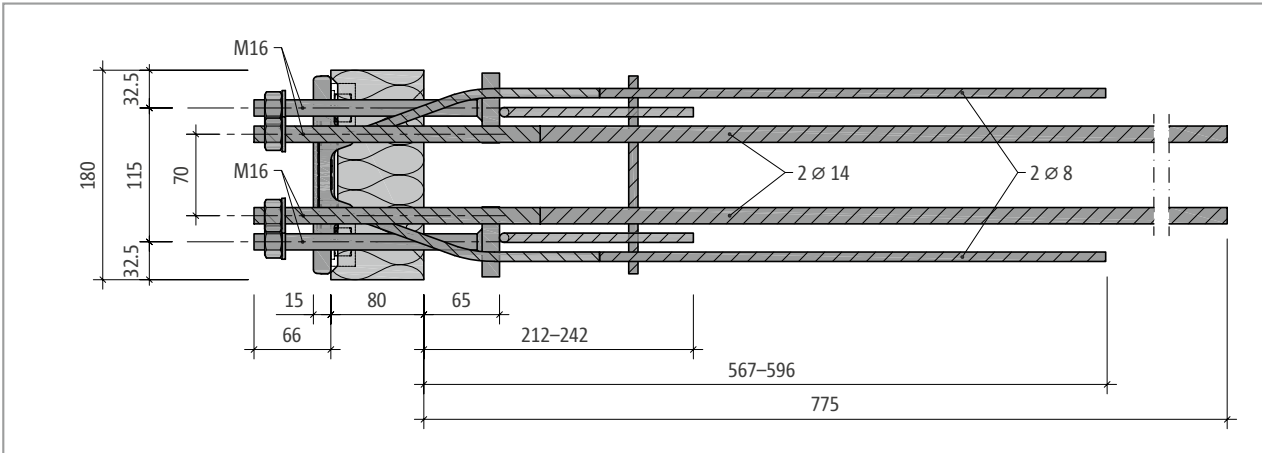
Schöck Isokorb® T type SK-M1-V1: Plan view
